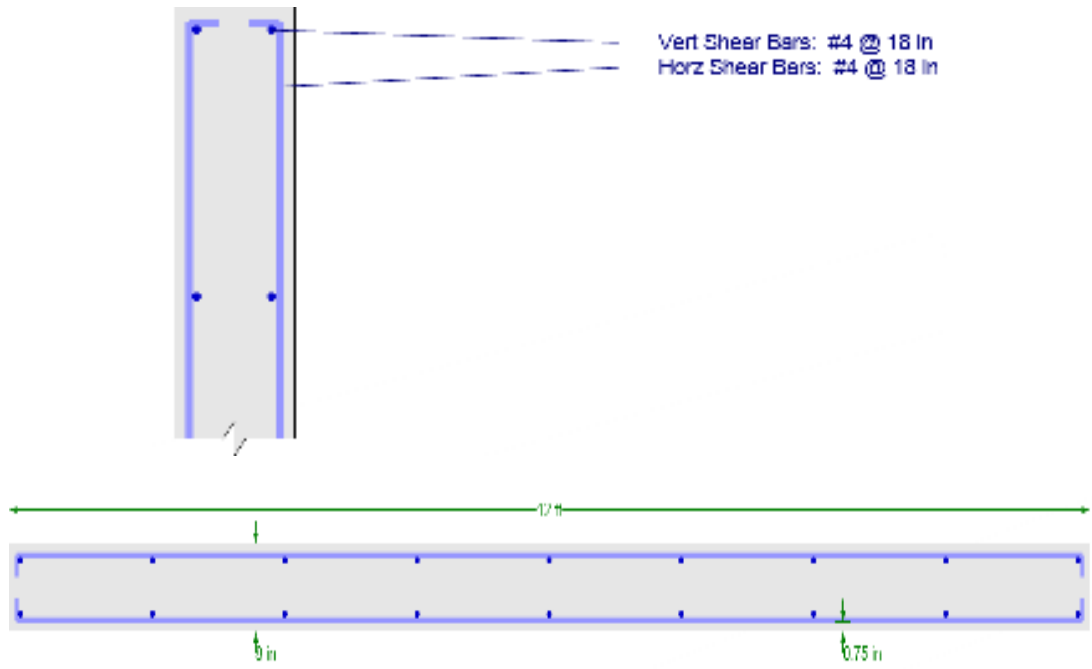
Building (B7-9S-L-S) Special RC Shear Reinforcement Details; Wall Section for Floors 7-9
